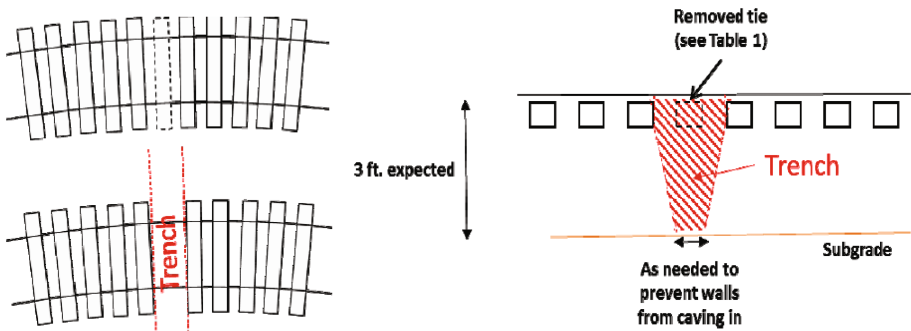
Plan and cross-sectional views of typical trenches dug in Sect. 3 HTL.
